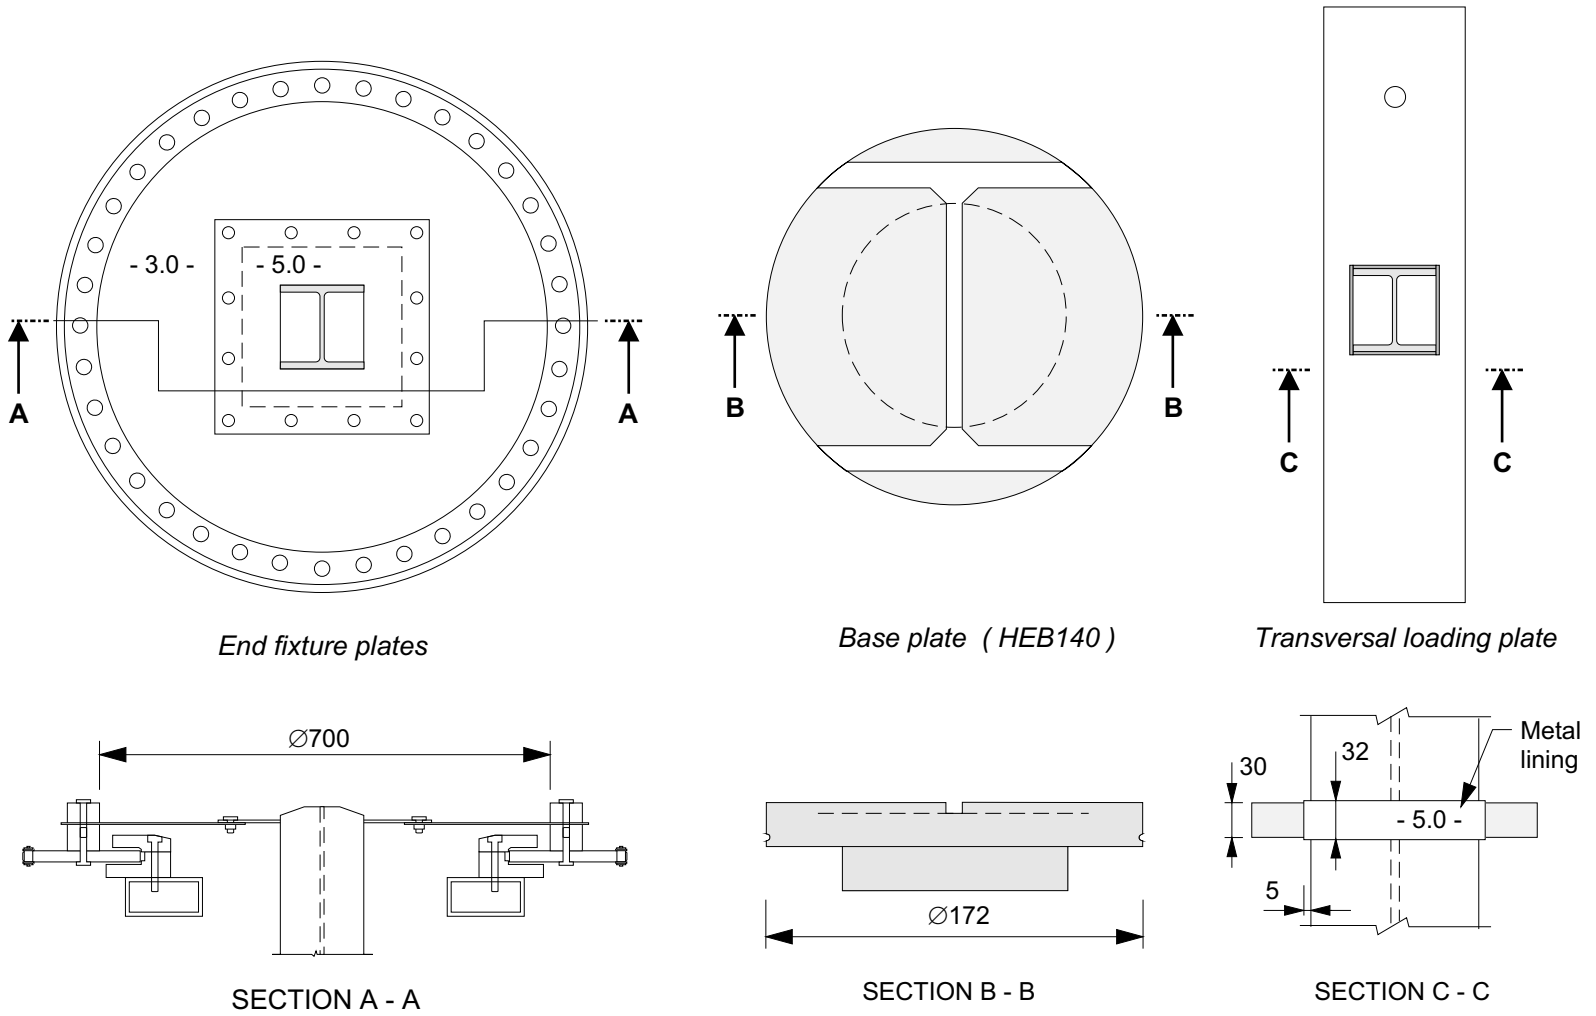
Details of end fixture plates, base plates and midspan loading plate.
